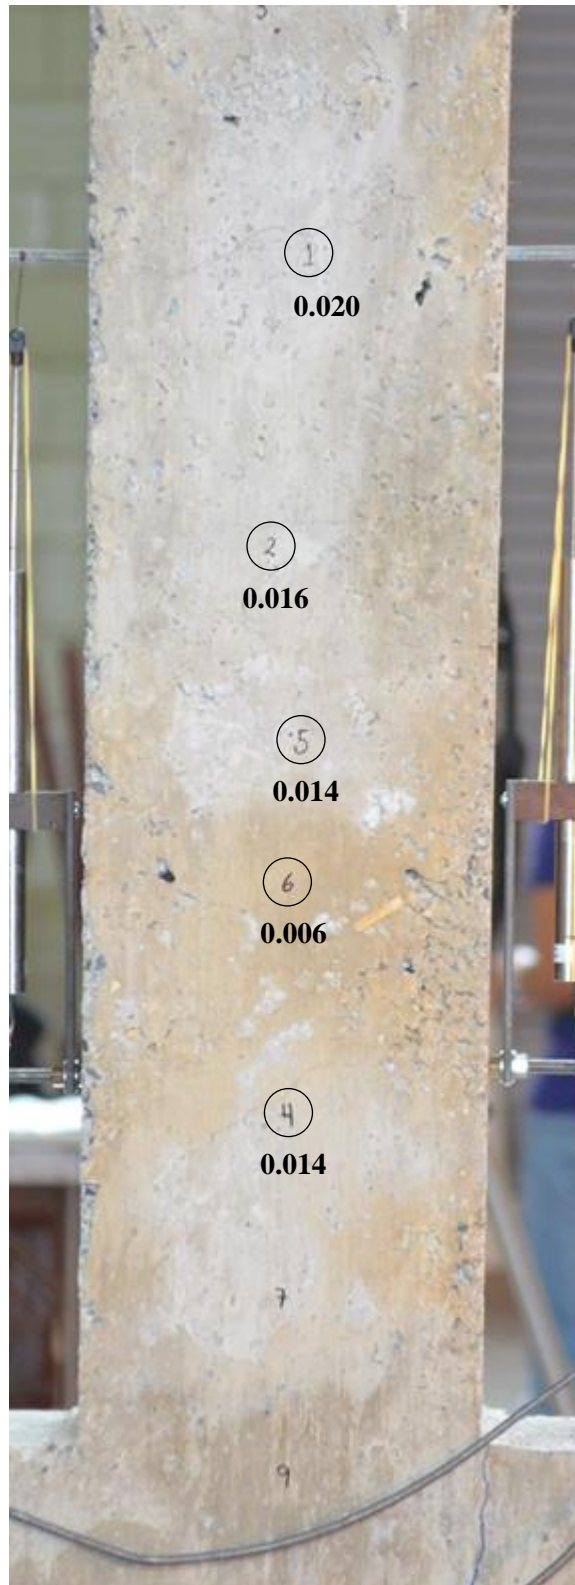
Cracks on east face of TS02 at Load Step 15
